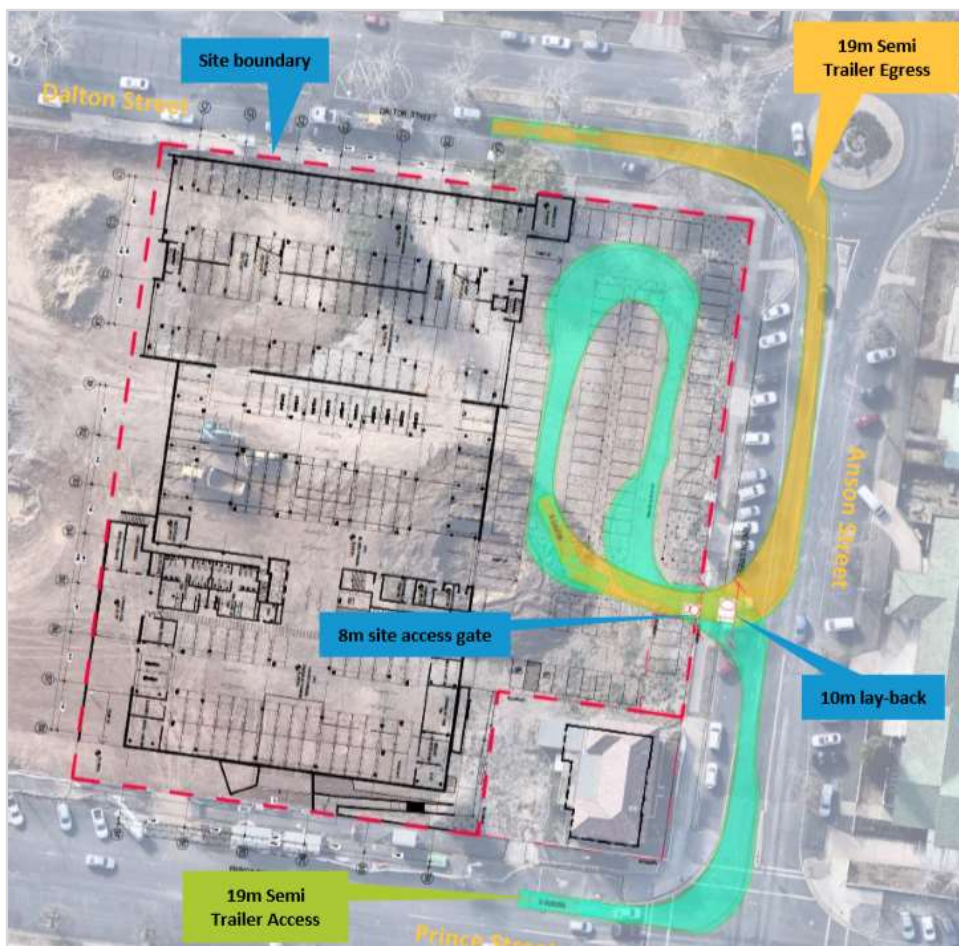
Construction vehicle site access and egress (Source: ptc.)
